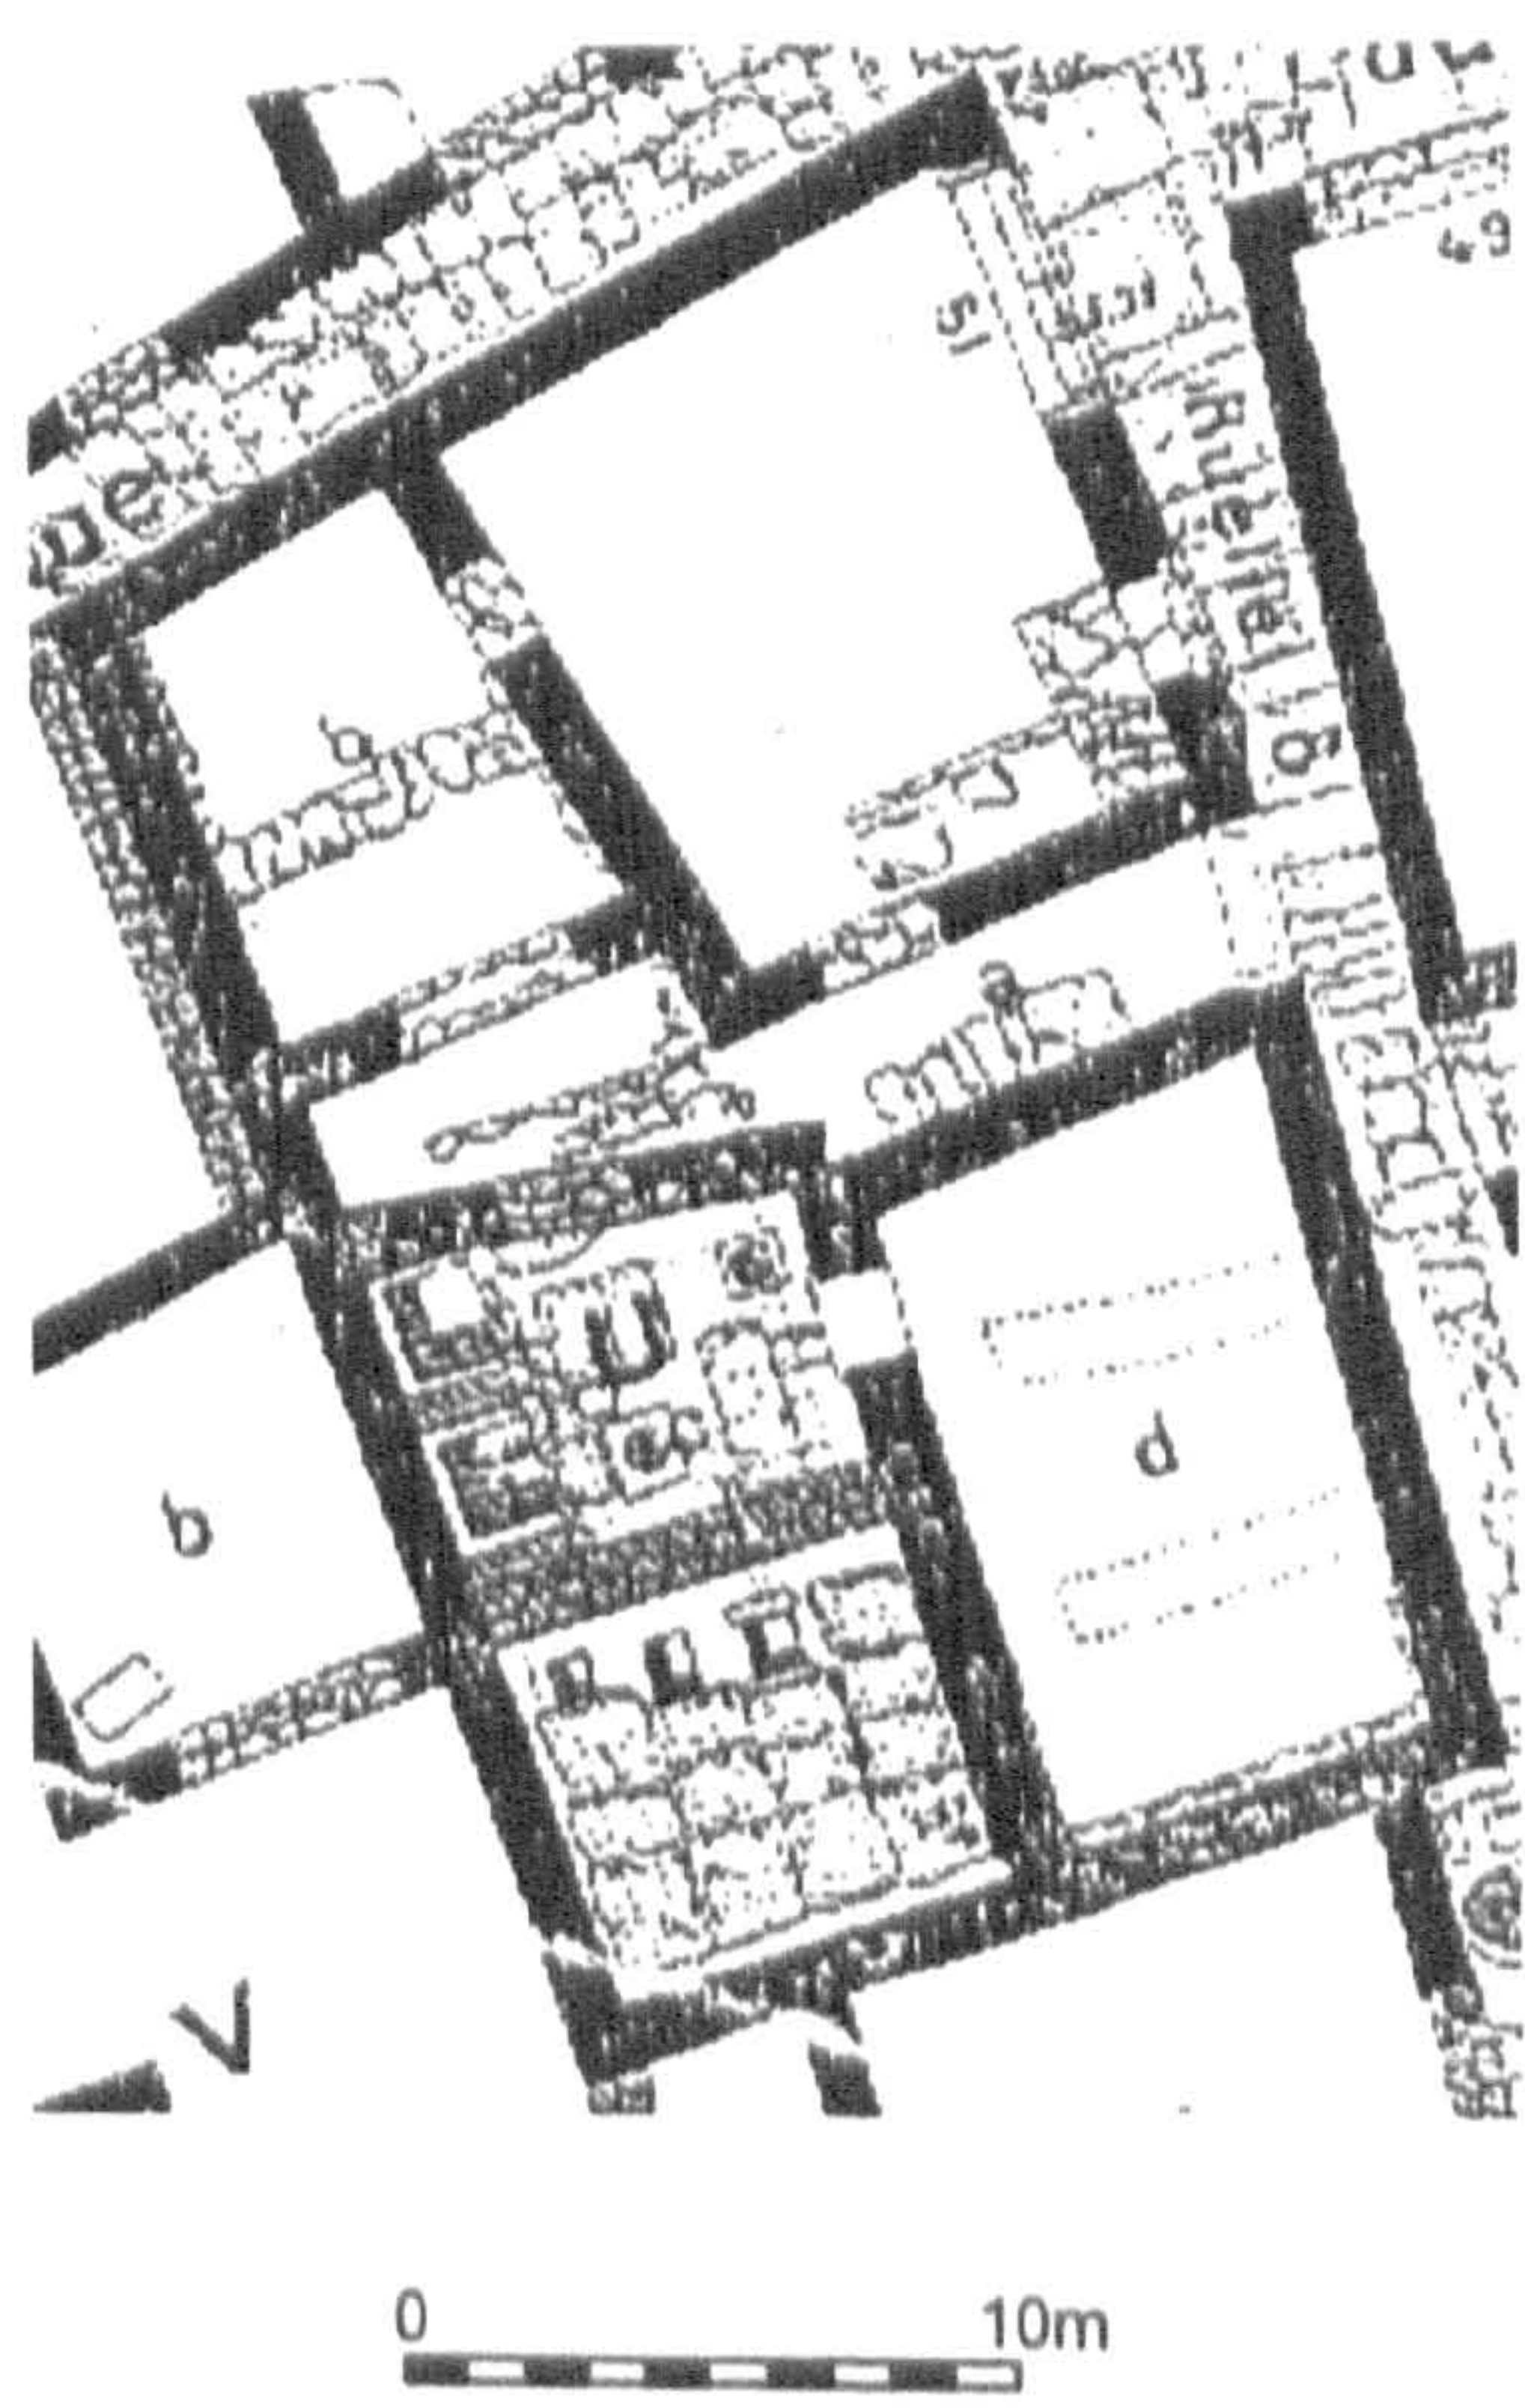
Plan of IV C (Chamonard 1922 Plates III-IV)
